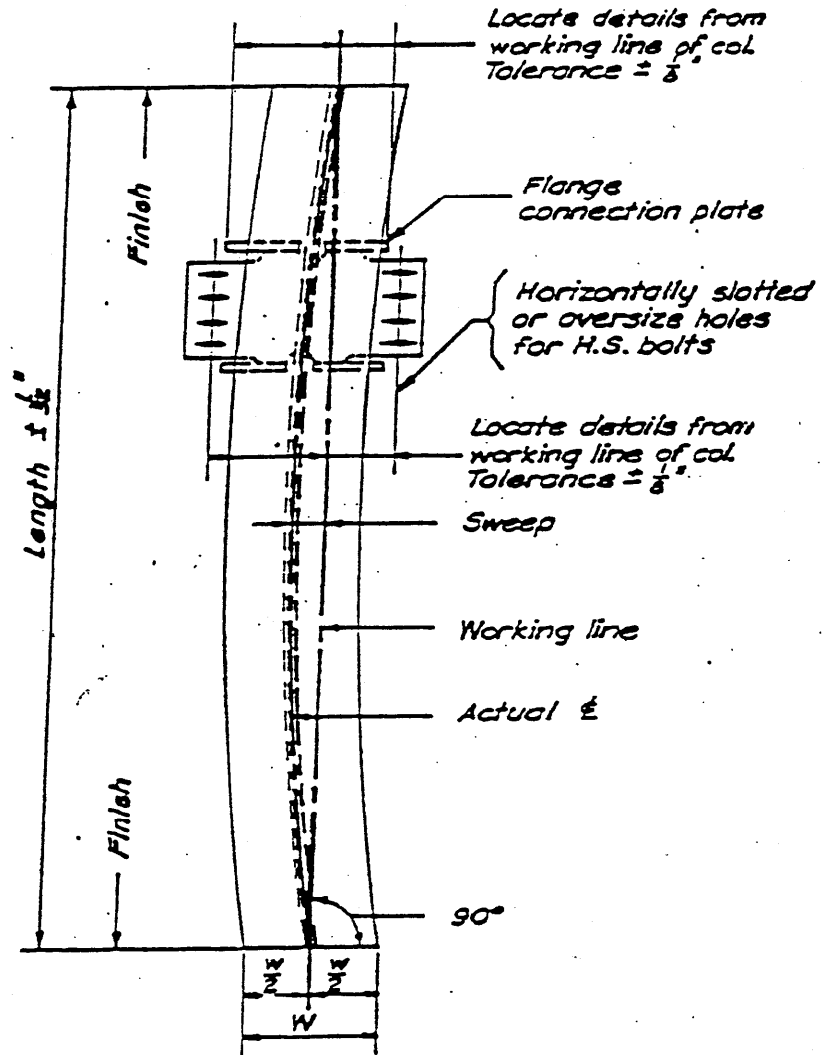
Adjustments for column sweep in beam-to-column connections.
